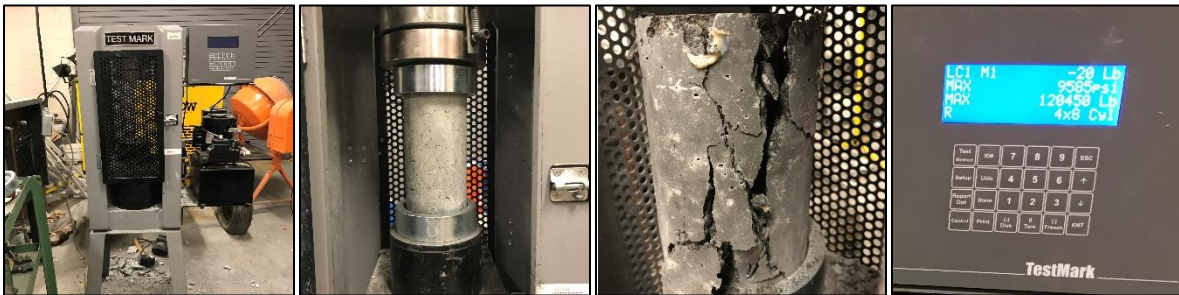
Testing machine, placing the specimen, crack in the specimen, and data collection
